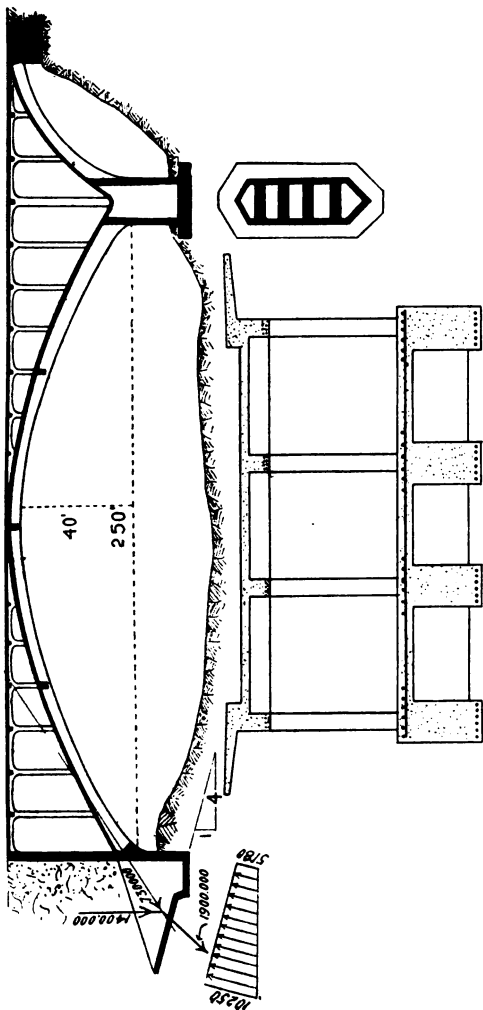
Longitudinal and Cross Section of Ribbed Arch Bridge, open Spandril construction. 250' Span.
